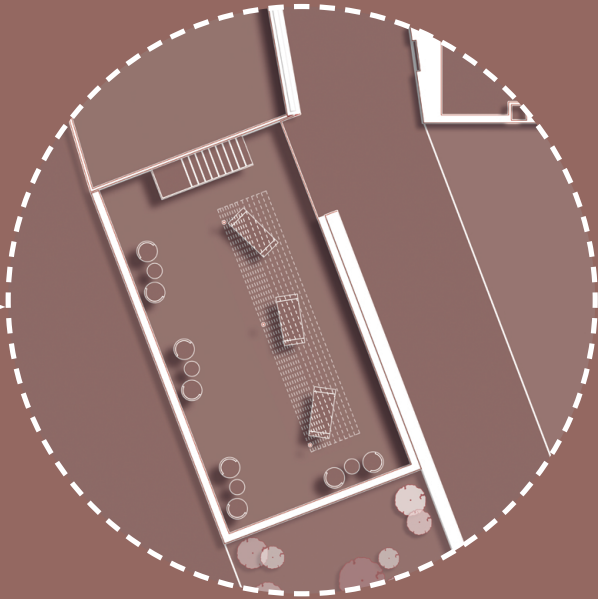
Terrace Plan Proposal Zoom. Own elaboration
